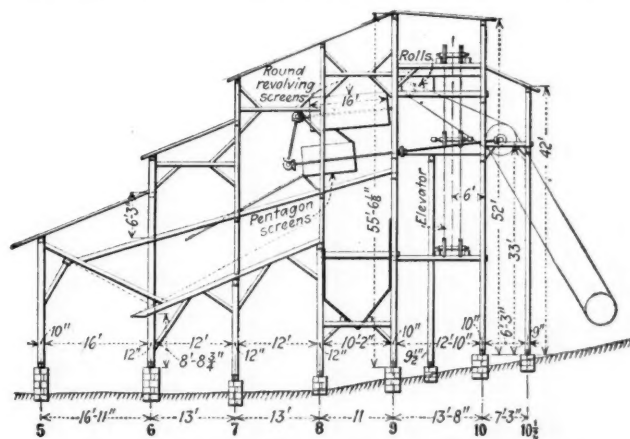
SECTION OLD FORGE BREAKER OF PENNSYLVANIA COAL CO.
